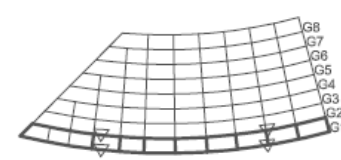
(Continued). Erection scheme 2B (Cross-frames are installed from the left skewed bearing line to the right radial bearing line)
